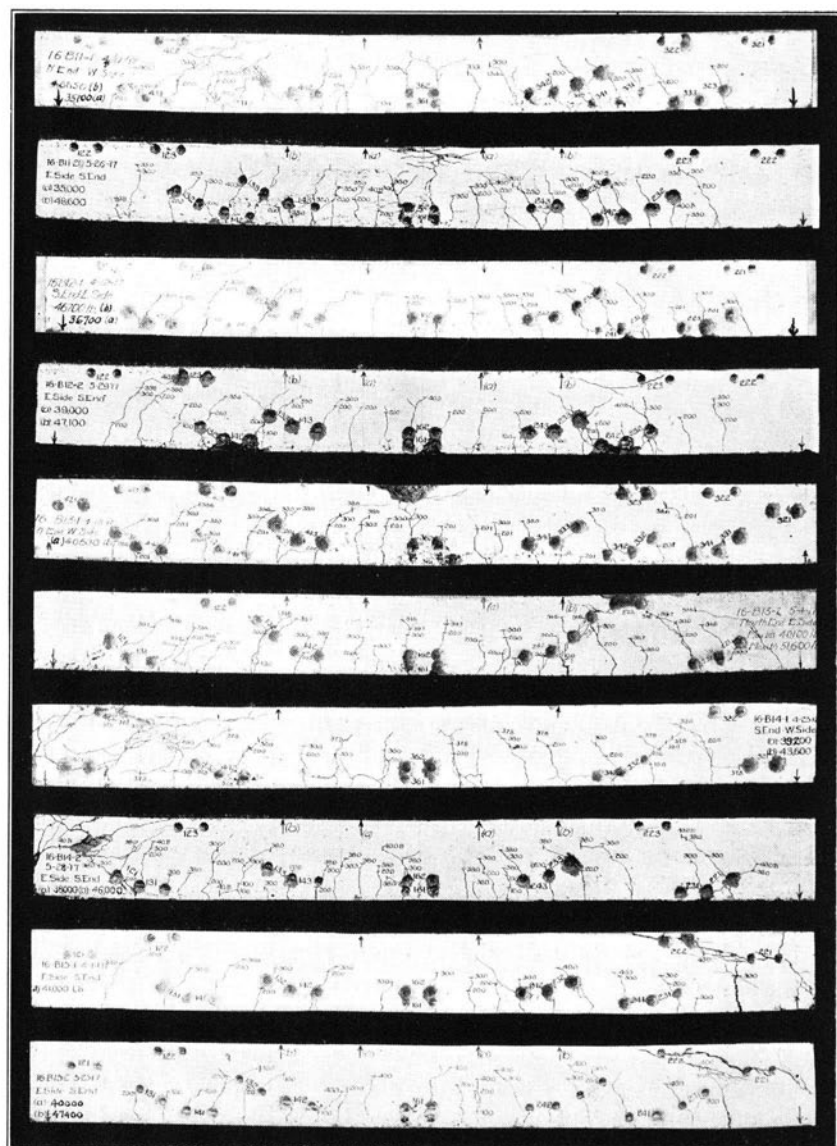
VIEWS OF BEAMS AFTER FAILURE, SERIES OF 1917
